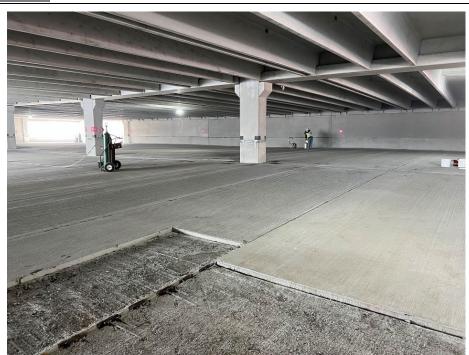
Status of second floor of superstructure, concrete to be poured tomorrow, 2/17, on the second and third floors. This photo is before forms were put in place.
